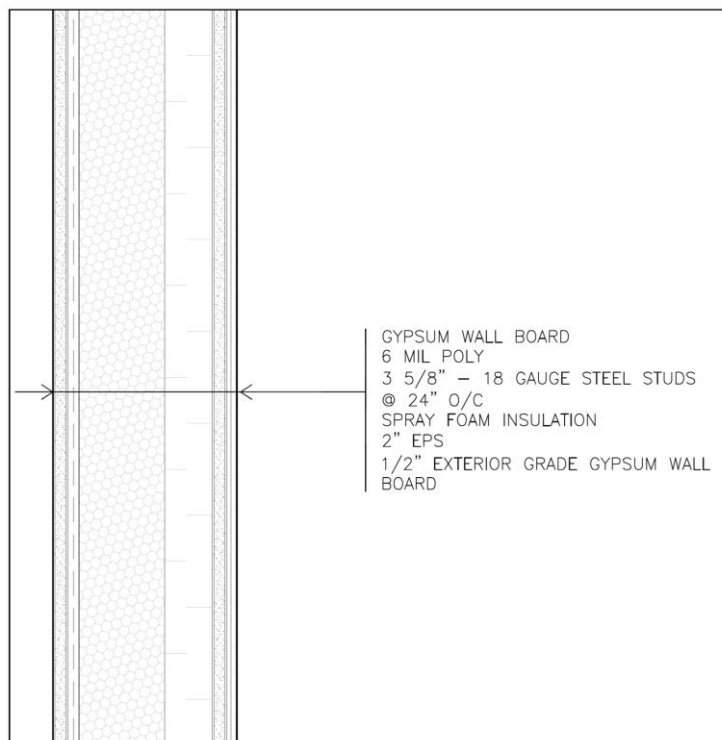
Wall Assembly Cross-Section (Twiddy, 2011)
